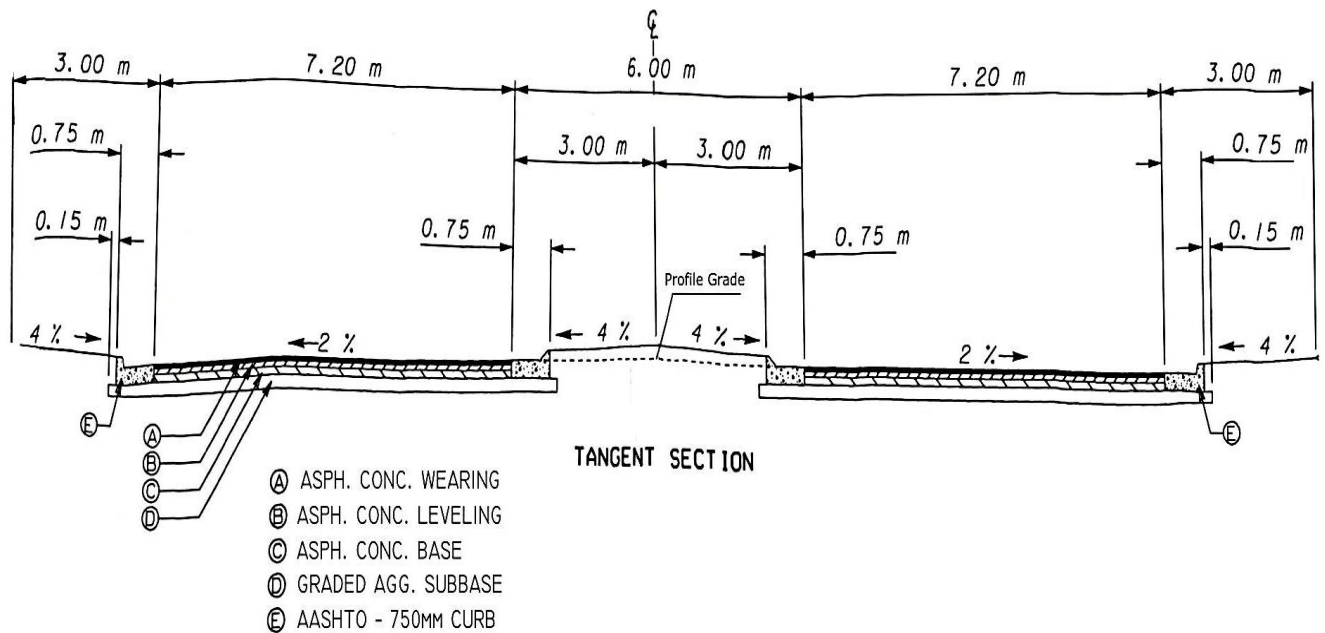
/2: Iraq Expressway No. One/ Typical Cross Section [2, R/9A]
